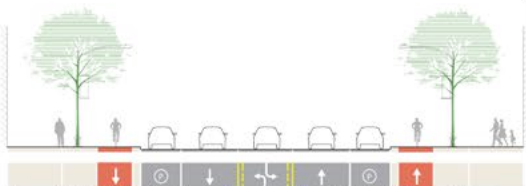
11th Street typical section San Jacinto Boulevard to Colorado Street
